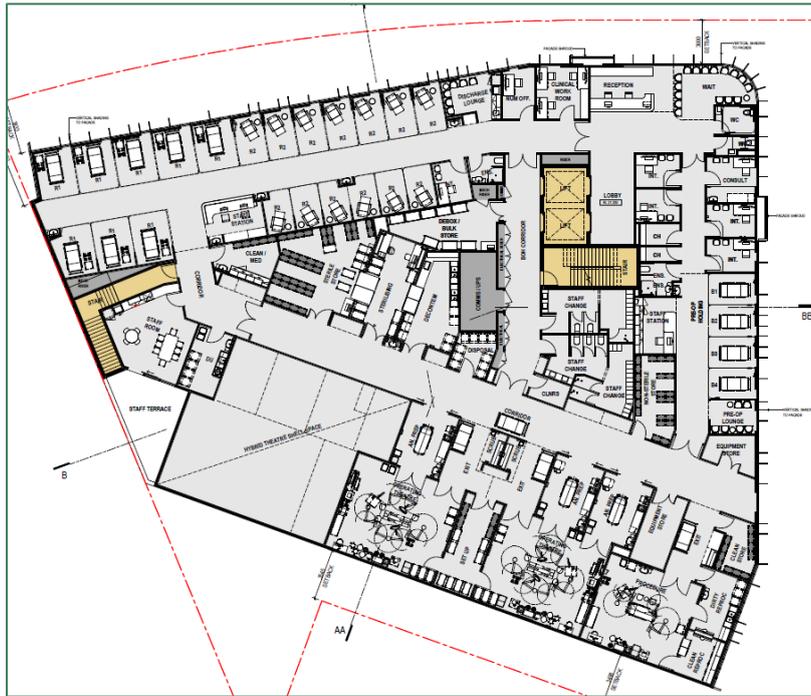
| Excerpt of Level 2 floor plan from Architectural drawings (Clarke Hopkins Clarke)
